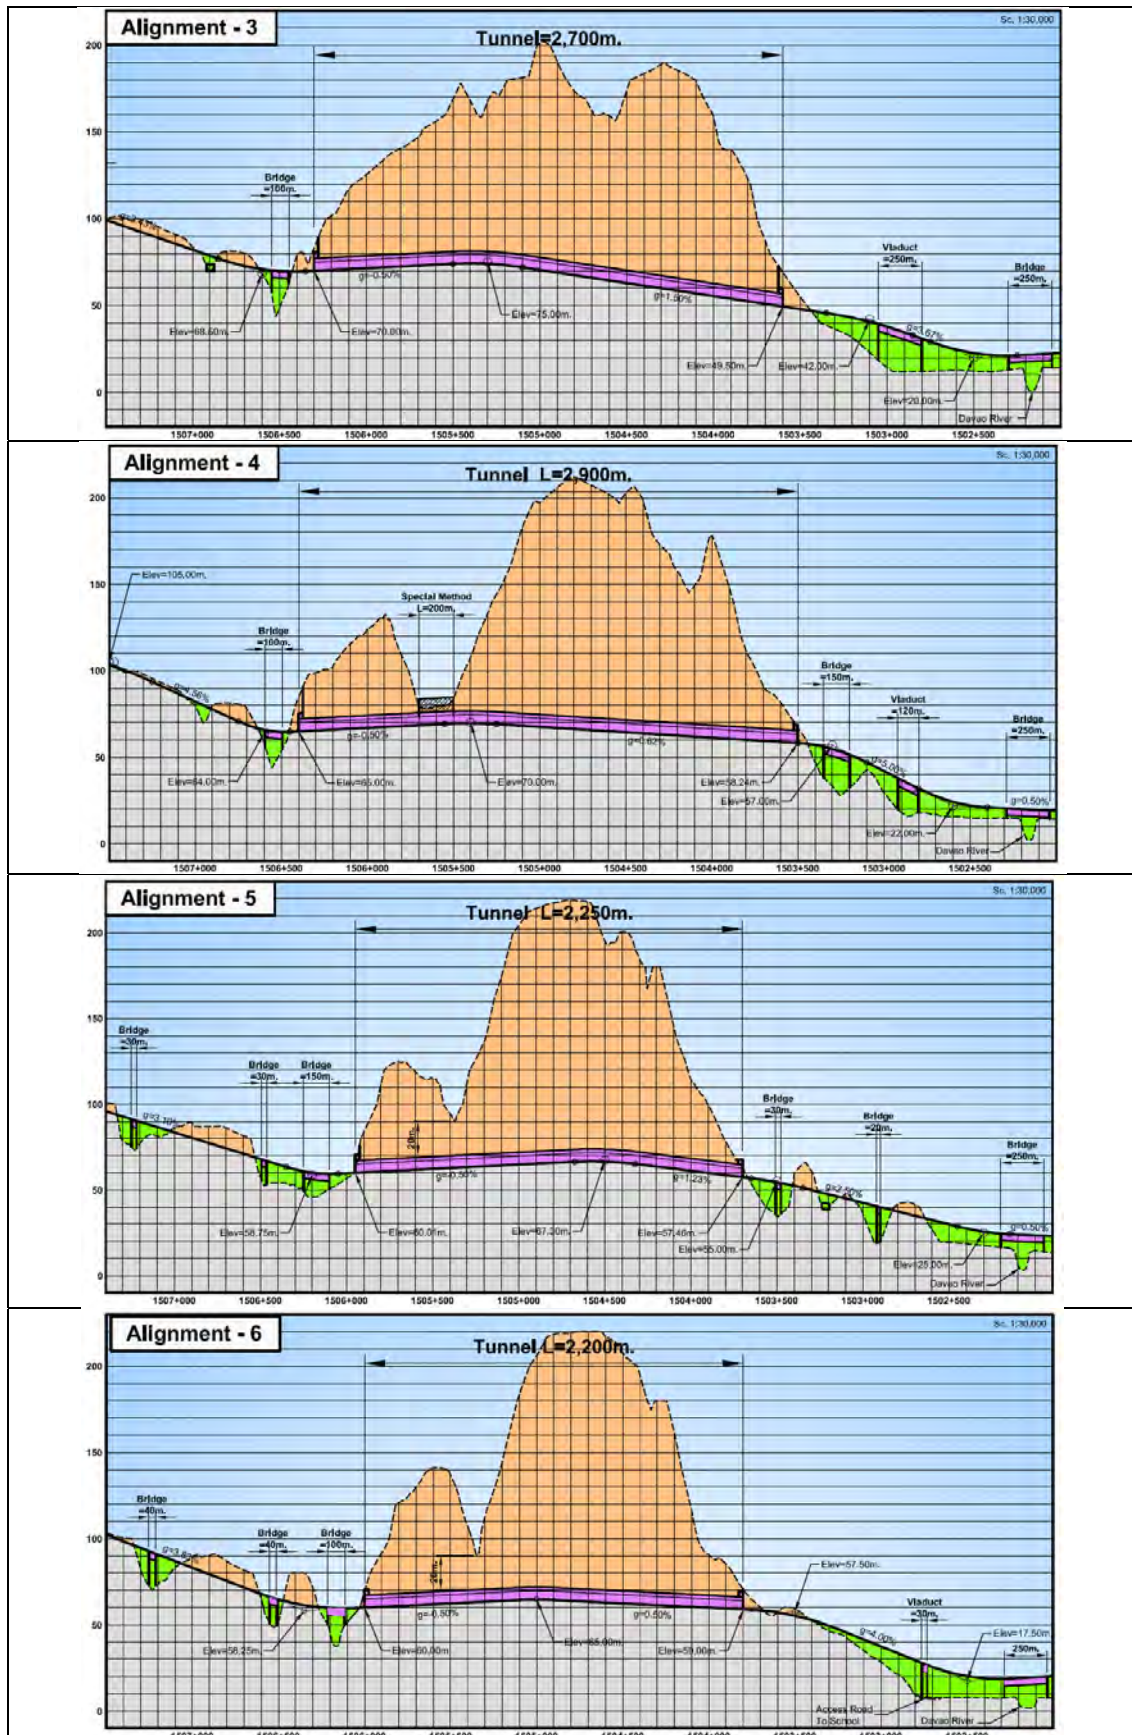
PROFILE OF TUNNEL SECTION
